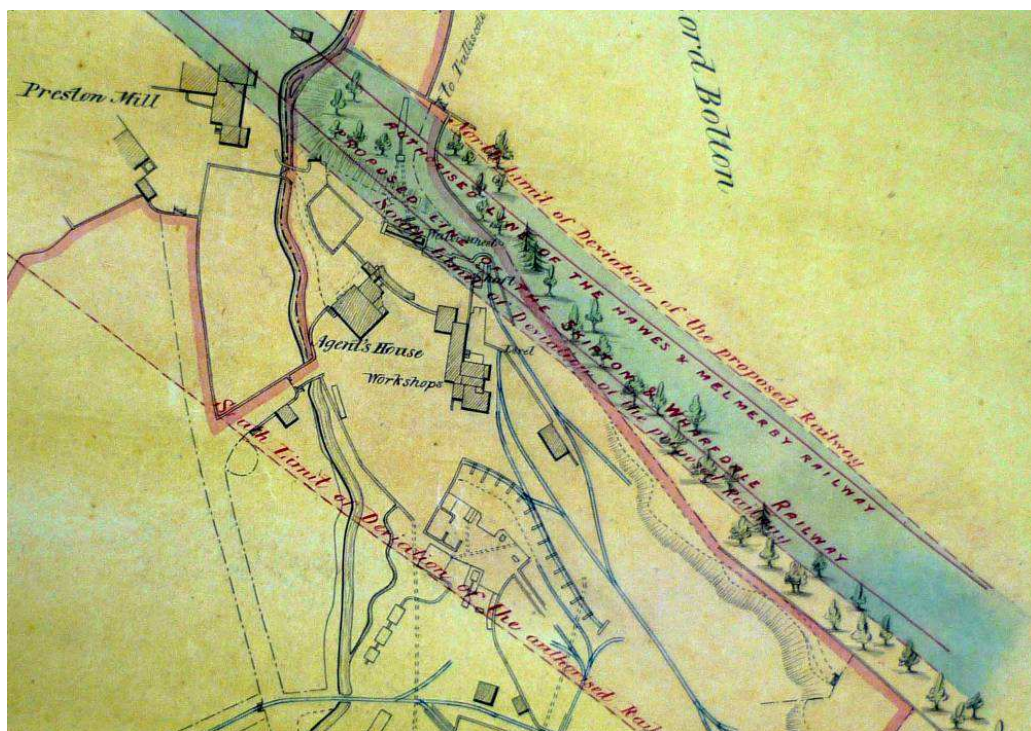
Extract of plan showing the proposed lines of railway passing through Keld Heads Lead Mines, 1866
